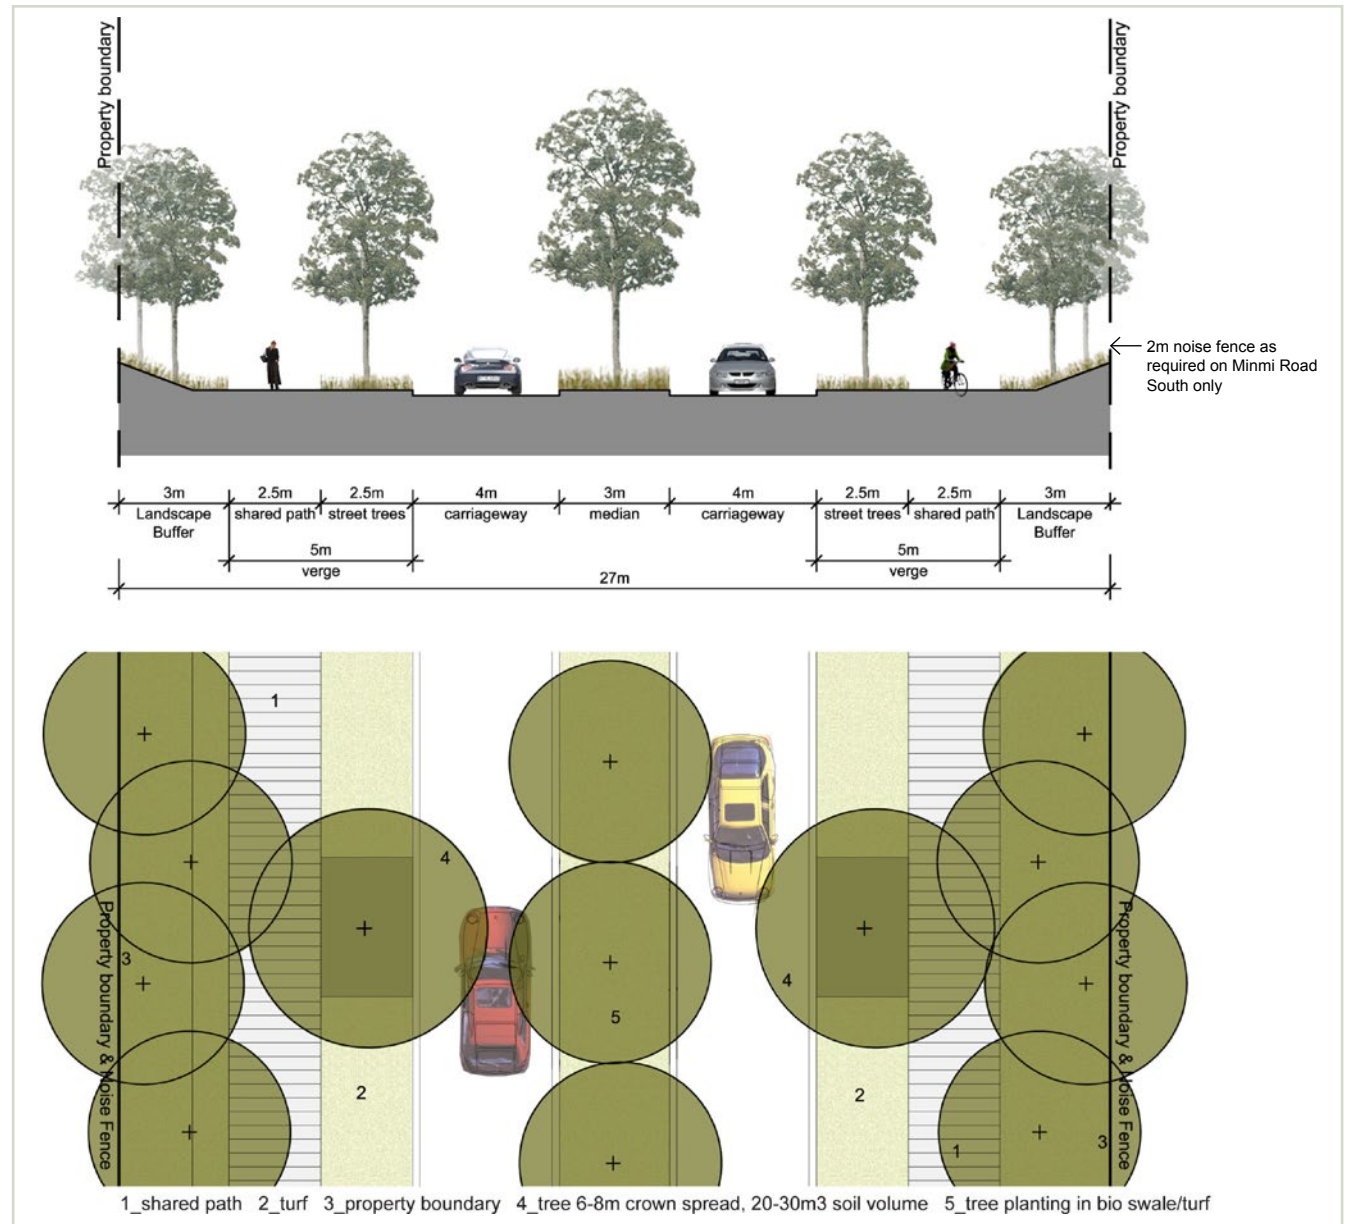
Proposed Minmi Boulevard - 27m (Section 1-1)
